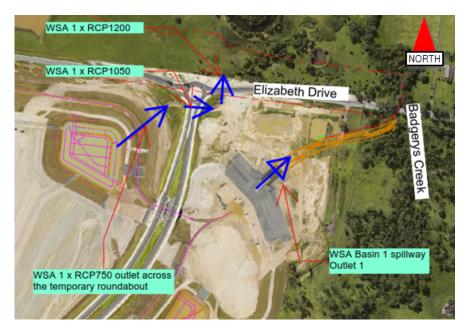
WSIA Basin 1 outlet locations into the M12 Motorway - West Package flood model. Blue arrows indicate WSIA cross-drainage structures (not to scale)
